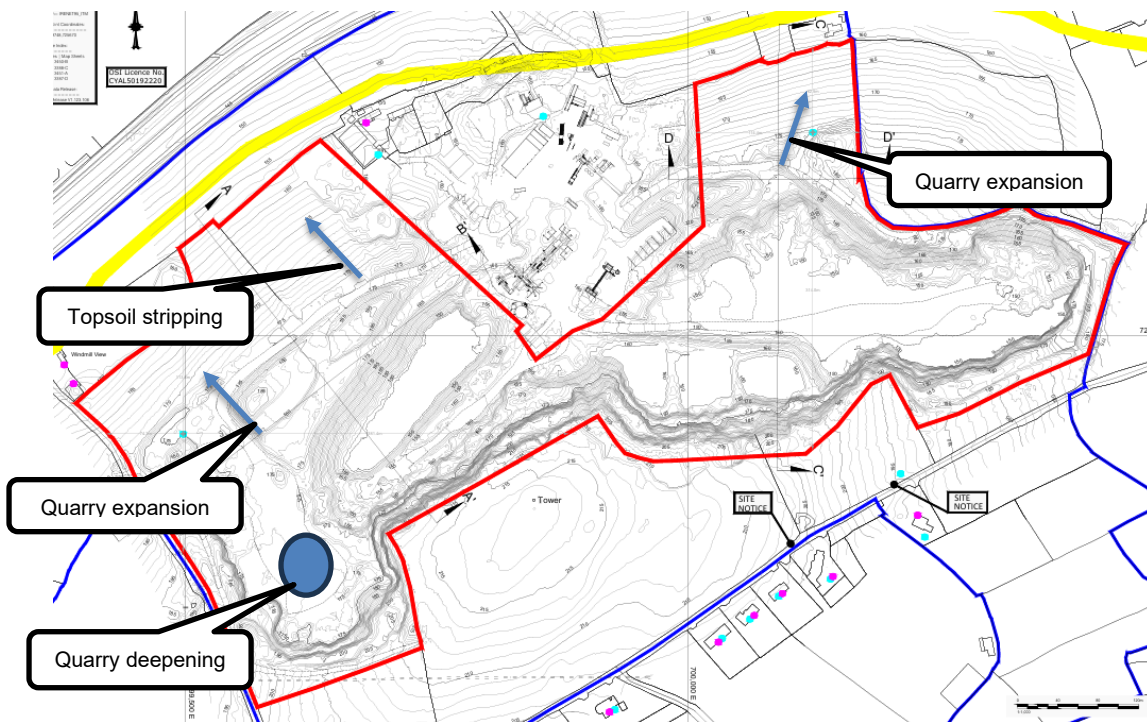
ABP-310466-21: Drg. No. 03 Rev. A: 'Existing Site Layout'
